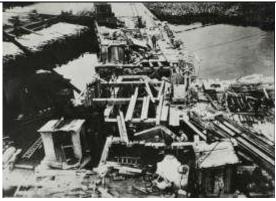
Coffer dam and formwork for the installation of conduits. State Rail Photos Series: 17420 Item: 364/48A SRNSW.
